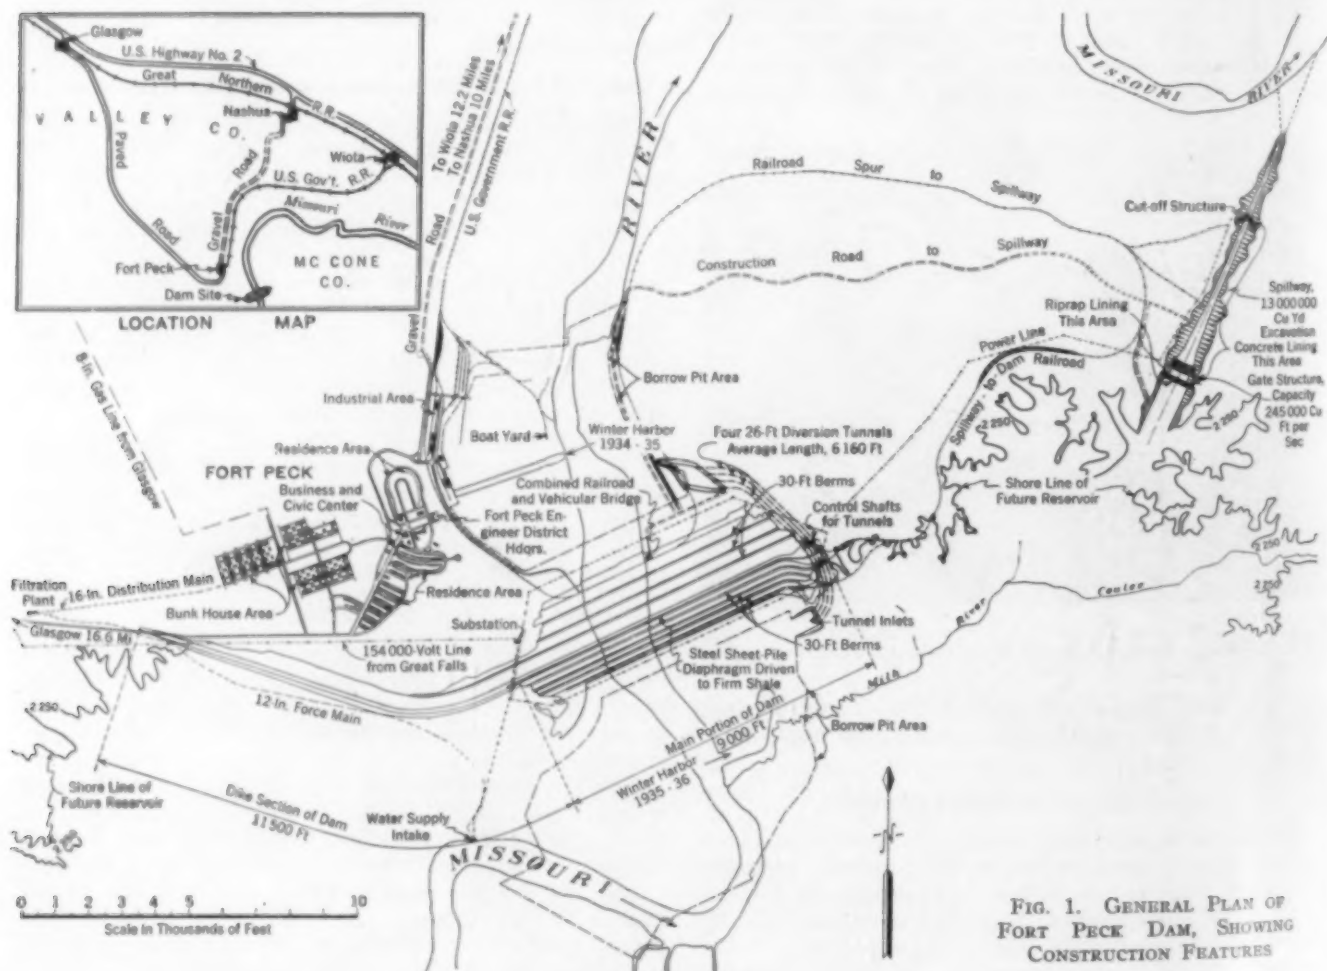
GENERAL PLAN OF FORT PECK DAM, SHOWING CONSTRUCTION FEATURES
